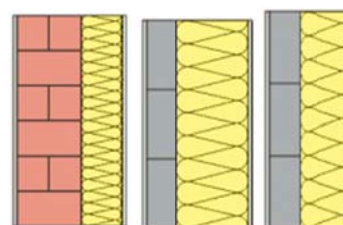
Thermal insulation of wall slabs in the period of construction a. 1990-2005, b. 2005-2010 and c. 2015 (solid walls - brick walls and masonry walls)
